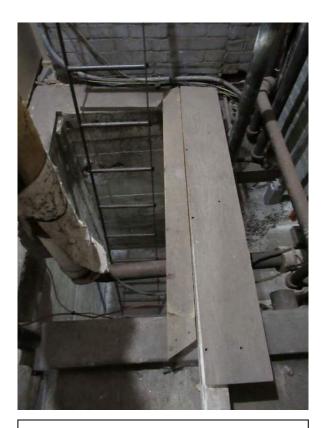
Access ladder down to basement from first floor mechanical room, looking south
